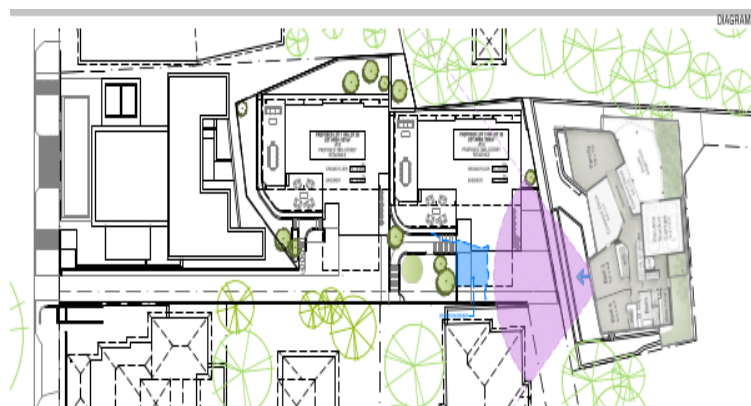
Floor Plan of Development Showing No.4 Lindsay Place First Floor View.
